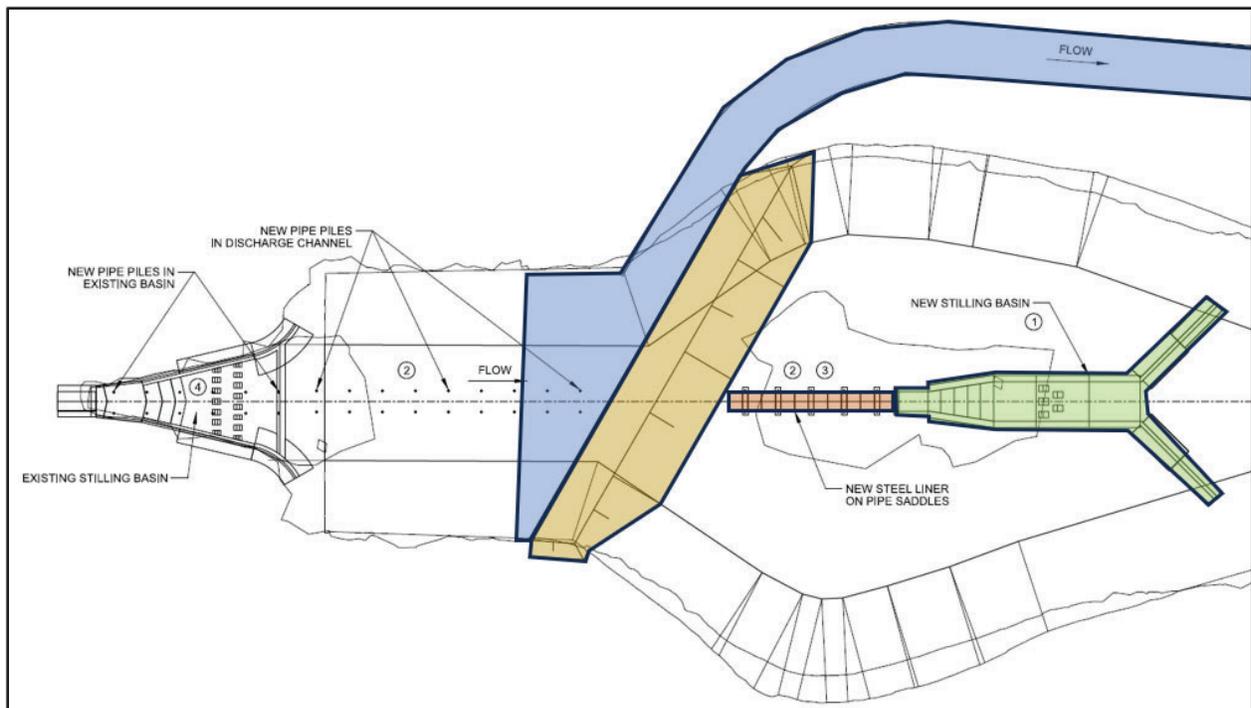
New Stilling Basin Plan showing New Stilling Basin (Green), Bypass Channel (Blue), Upstream Cofferdam (Brown) and New Steel Liner Sections (Red).
